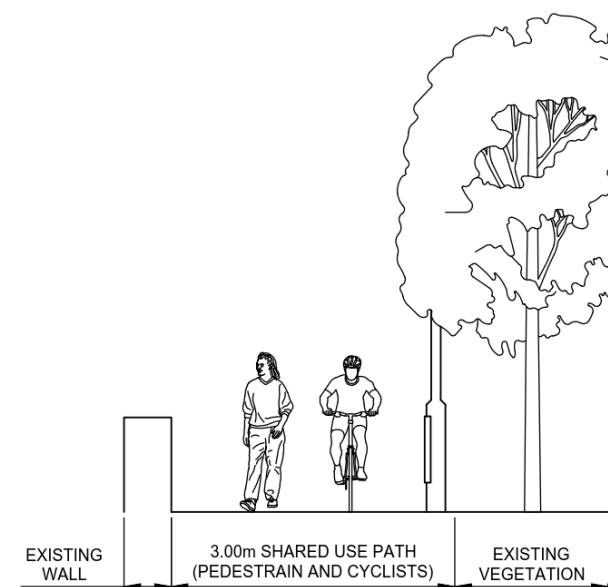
Cross Section Route 4 – Existing Informal Path adjacent to Wedderburn Terrace
